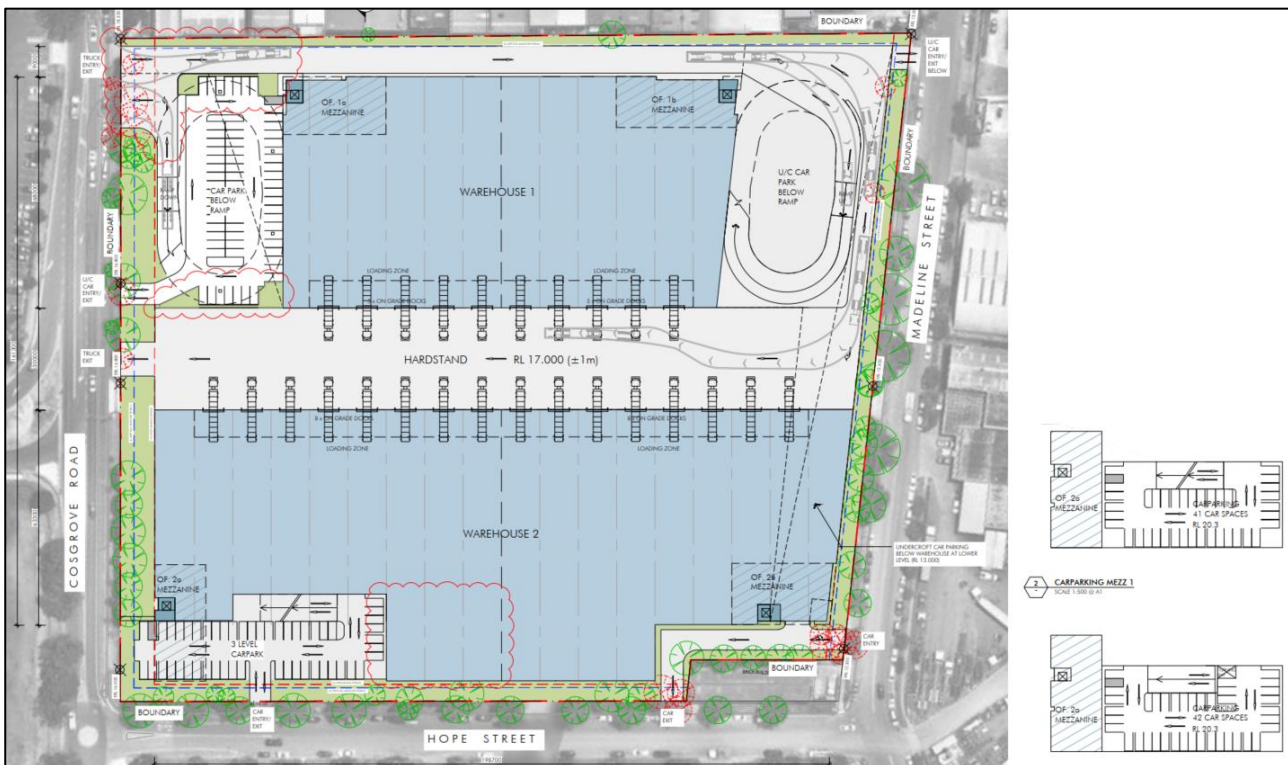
Proposed Grand Floor Plan and Car Park Mezzanine 1&2
